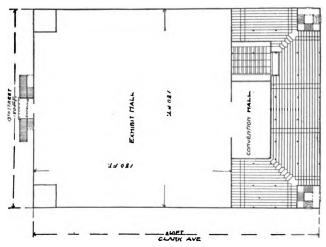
EXHIBIT HALL, STREET RAILWAY CONVENTION, ST. LOUIS.
